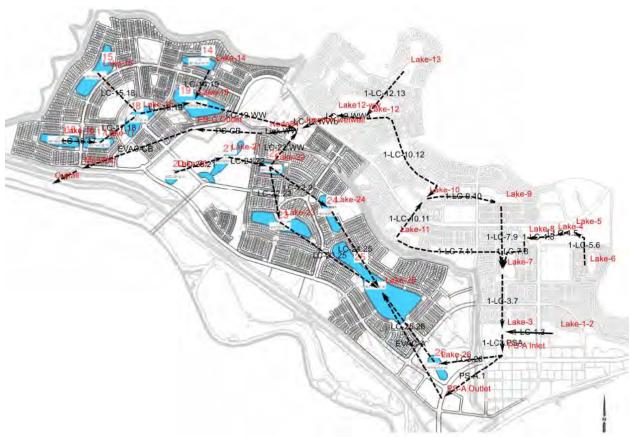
Example plan View of XPSWMM Model for phase 2
